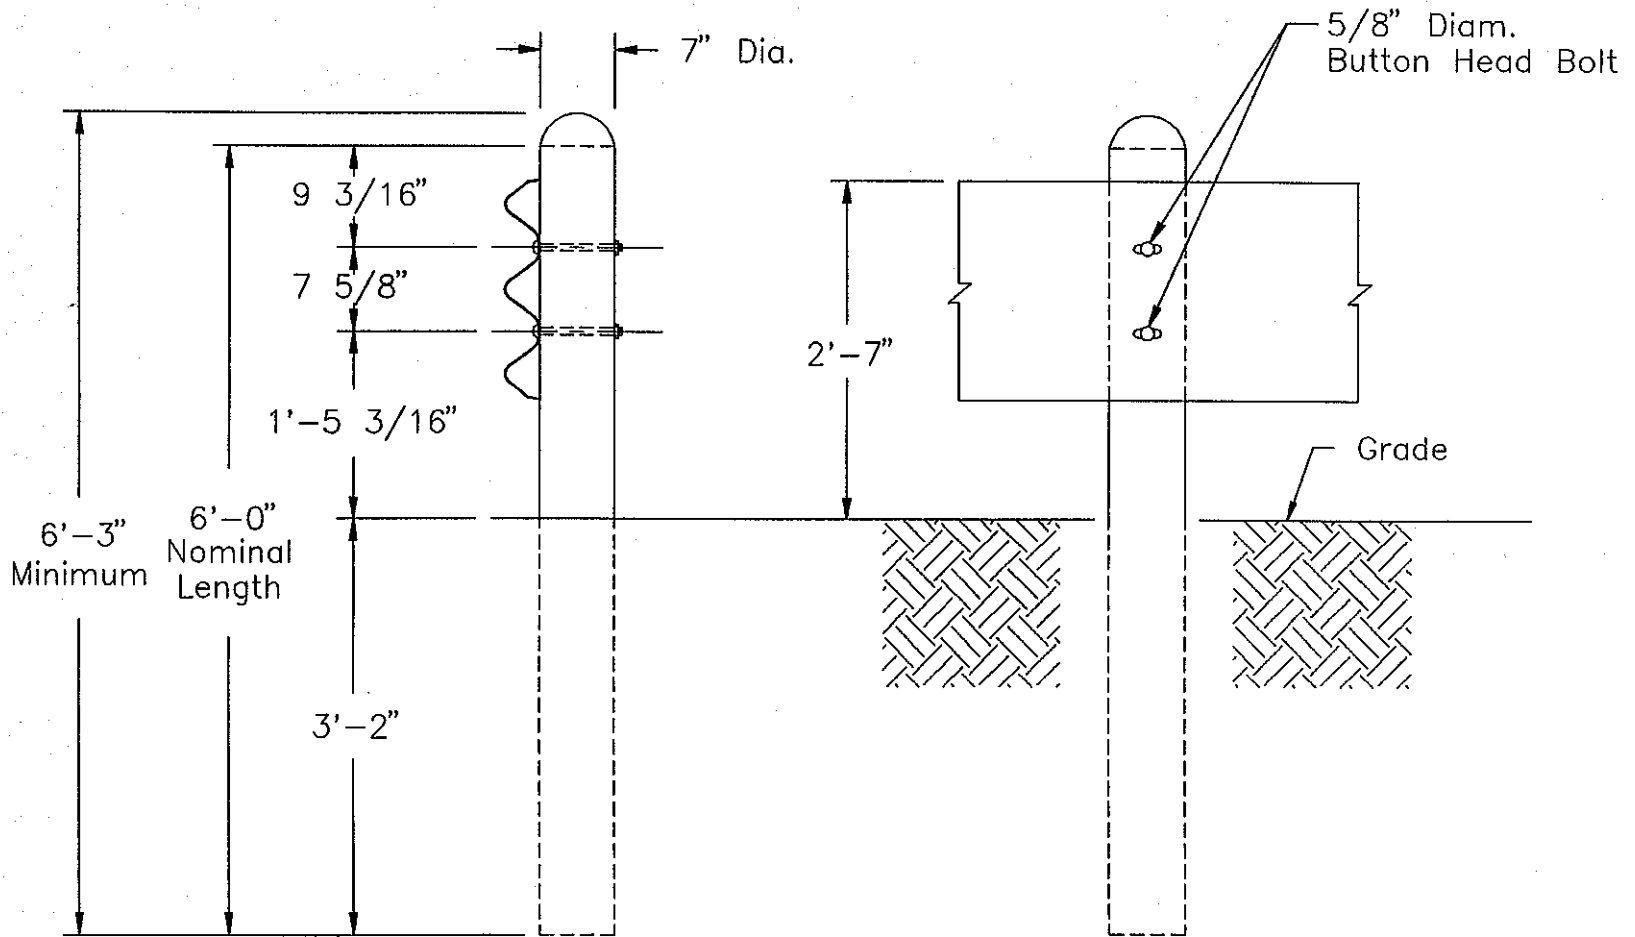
Construction drawing for short-radius thrie-beam guardrail treatment.
